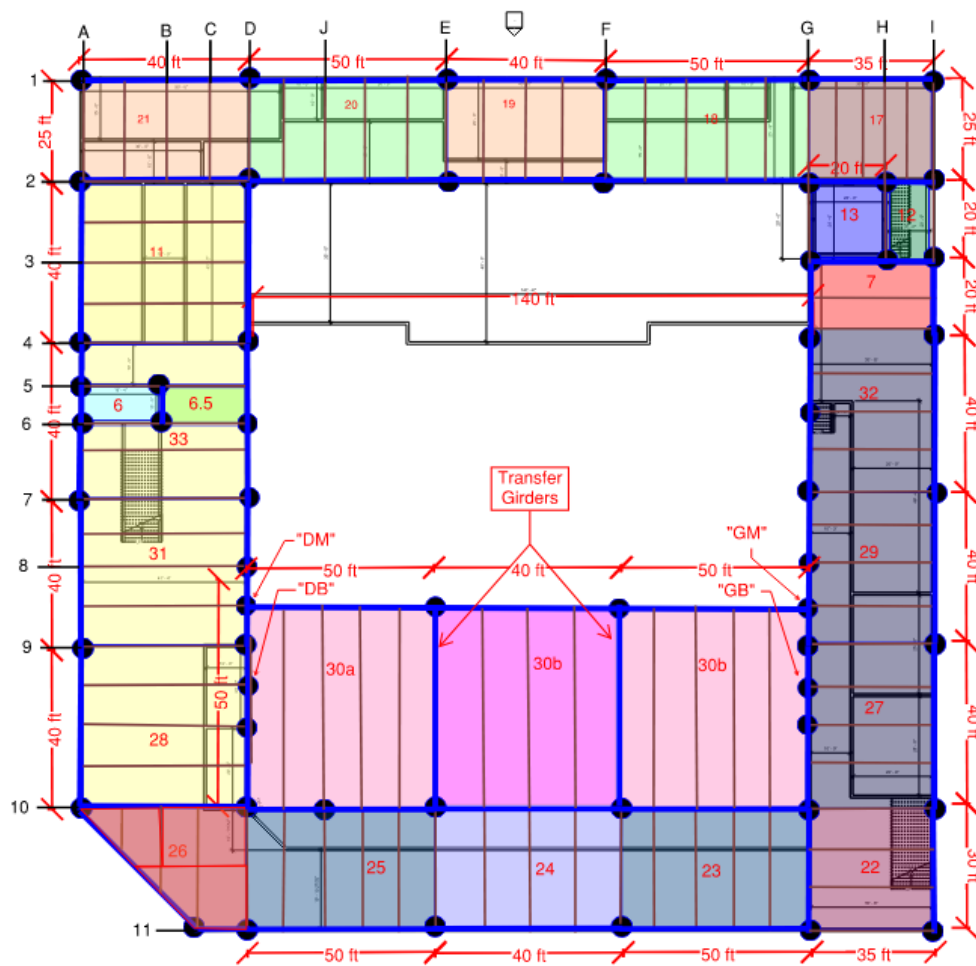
First-floor Layout of Beams, Girders, and Columns in Bluebeam Revu
